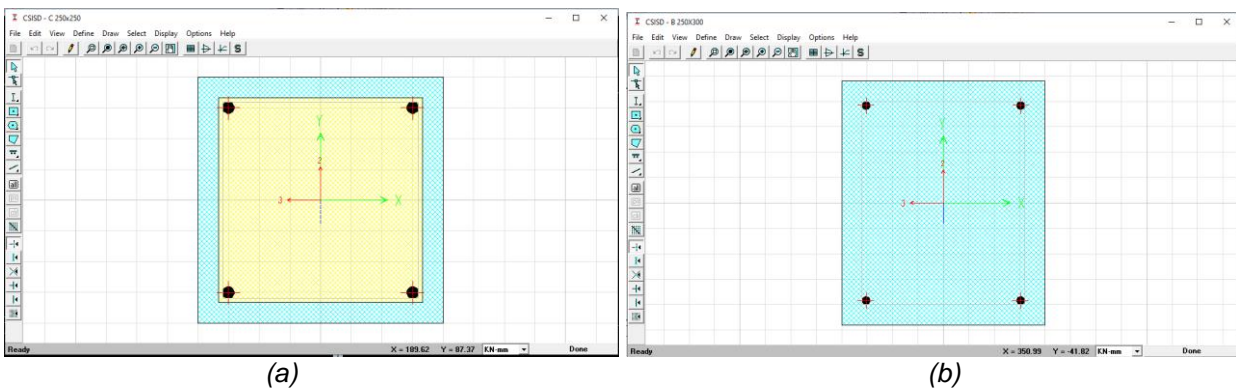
Cross section of (a) column and (b) beam generated using Section Designer of SAP2000
